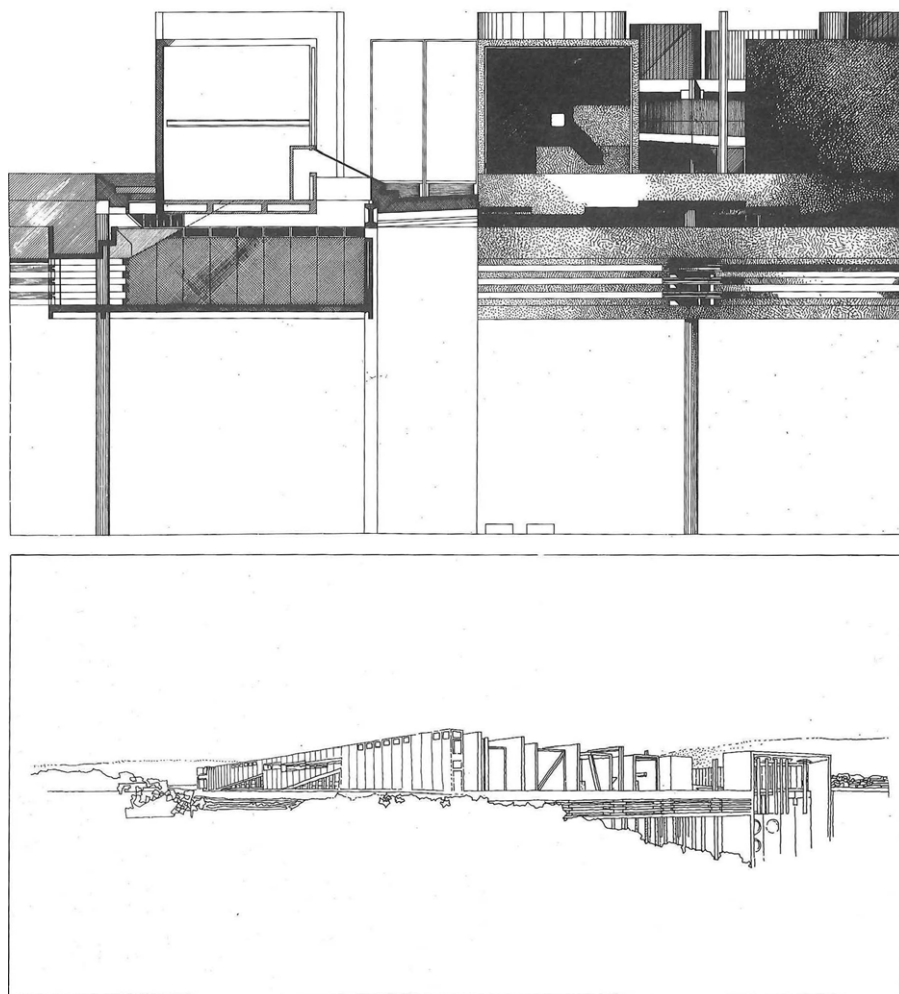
From top to bottom: Details and view of the downstream façade.
